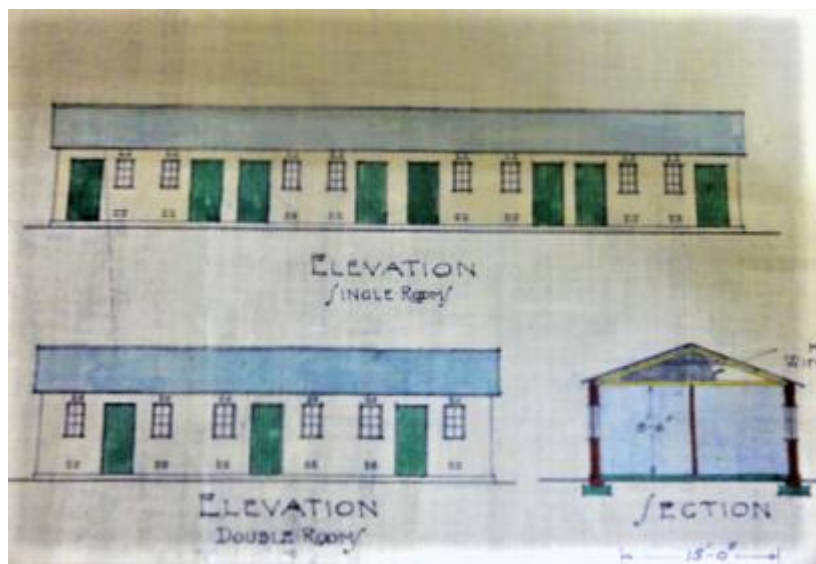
These plans show single and double rooms for migrant workers and were among the first buildings to be constructed together with the main barracks. (KAB Portion of plan M1/3375)
